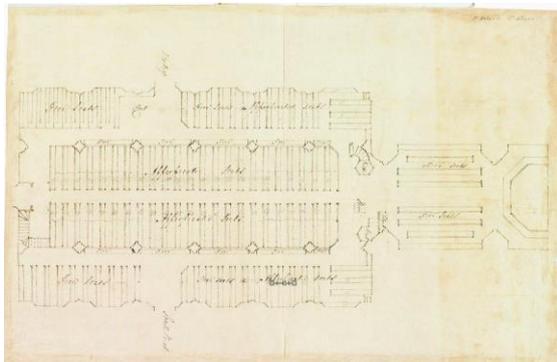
A drawing of the plan of St Peter's church in 1847-9 clearly showing a doorway, which no longer exists, in the North wall of the nave
